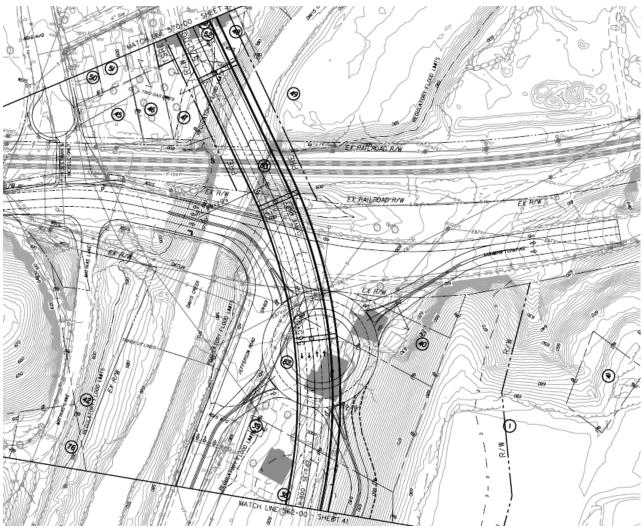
Preliminary plans for a new roundabout with Alternative 5 at the intersection between Jefferson Road and Kanawha Turnpike.
